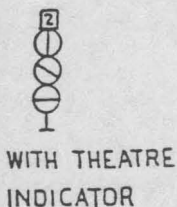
DETAILS OF WORK REFERRED TO IN SECTION B - continued
